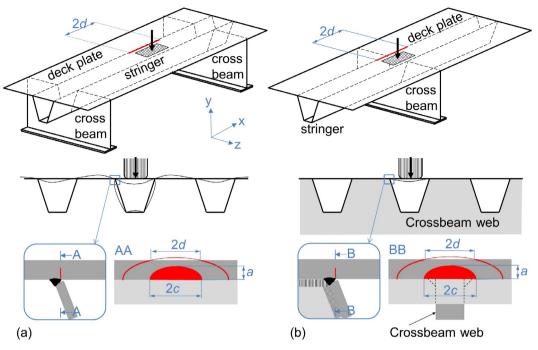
Geometry of the deck plate crack: (a) Deck plate crack between crossbeams; (b) Deck plate crack at crossbeam.
